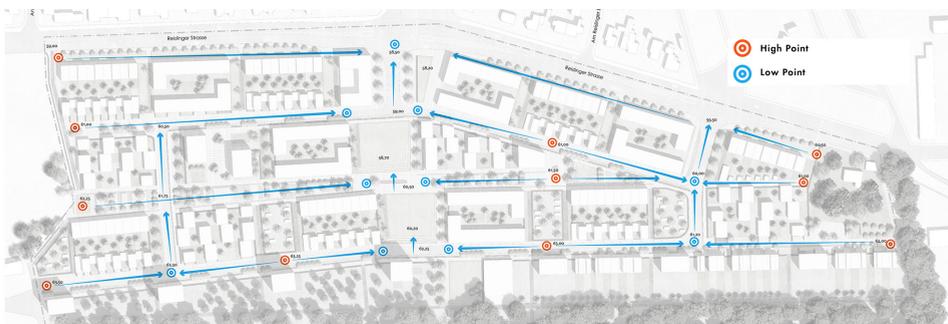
Example of a conceptual site drainage plan with high & low points, resulting slope directions and dedicated detention areas (© Ramboll Studio Dreiseitl)
